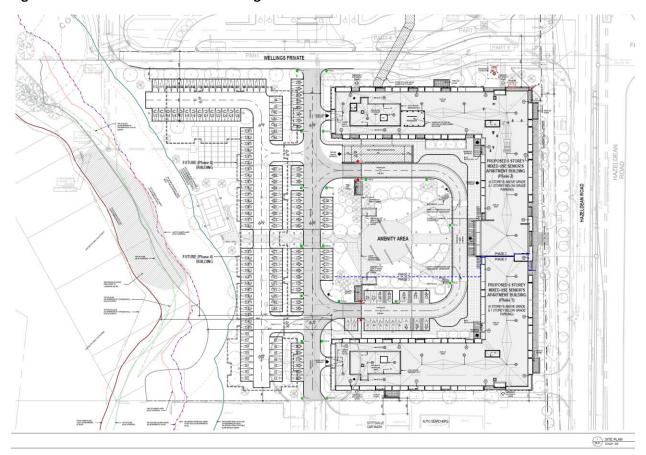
is the Site Plan and Elevation Drawings that show the proposed site development at build out and elevation drawings for all buildings.
